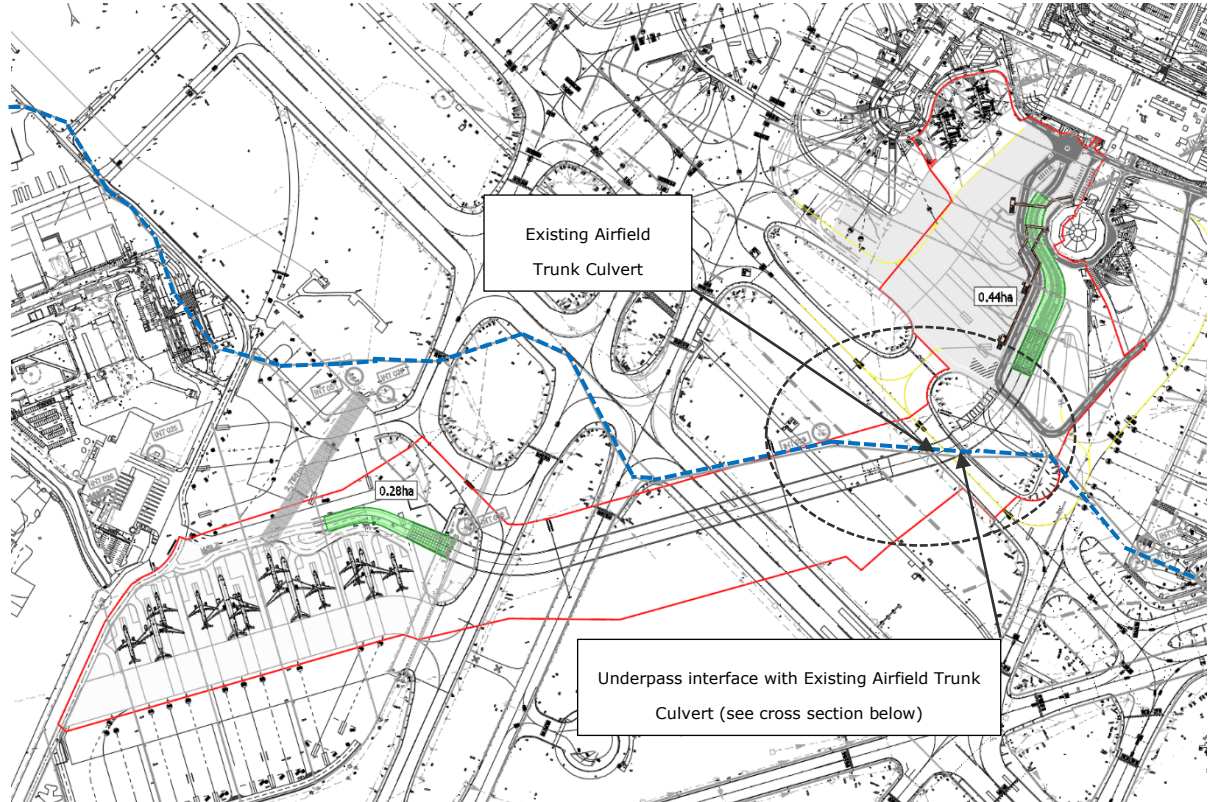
Underpass Layout and Airfield Trunk Culvert Interface
